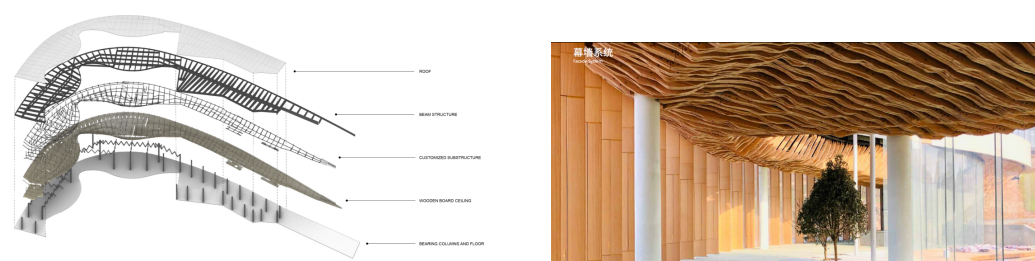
Robotic construction example: No. 2 Visitor Center of Nanjing Garden Expo Park.
